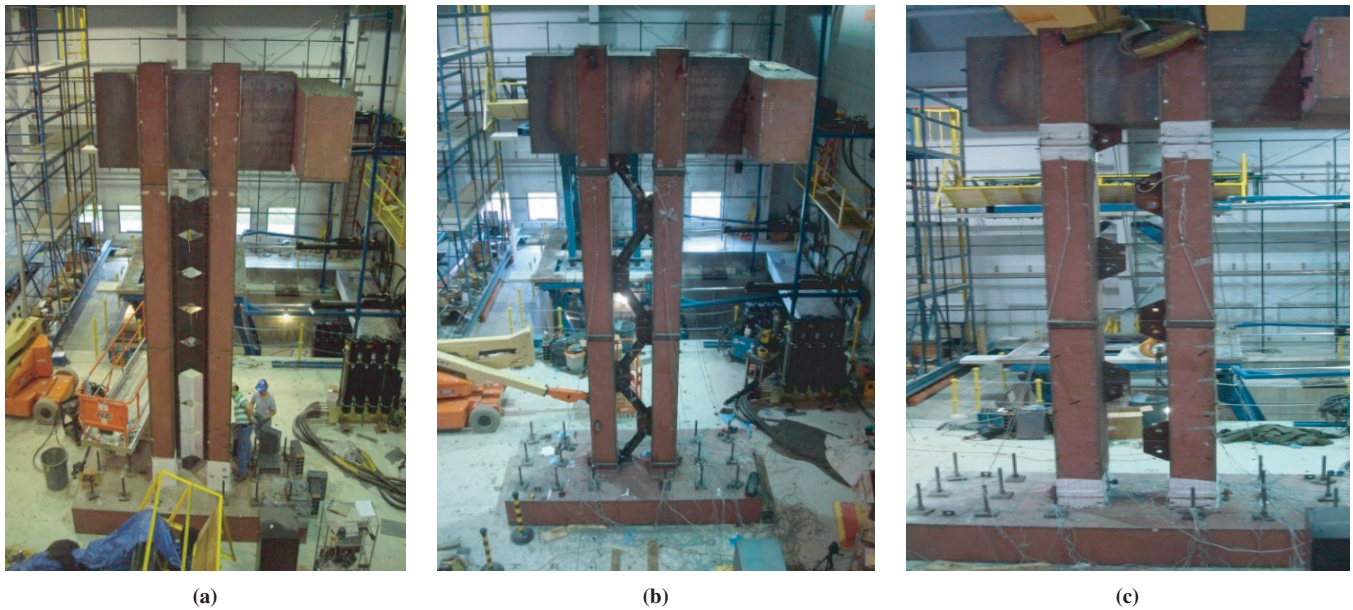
Experiment setup: (a) bridge pier with SPSLs, (b) bridge pier with BRBs, and (c) bare bridge pier.
